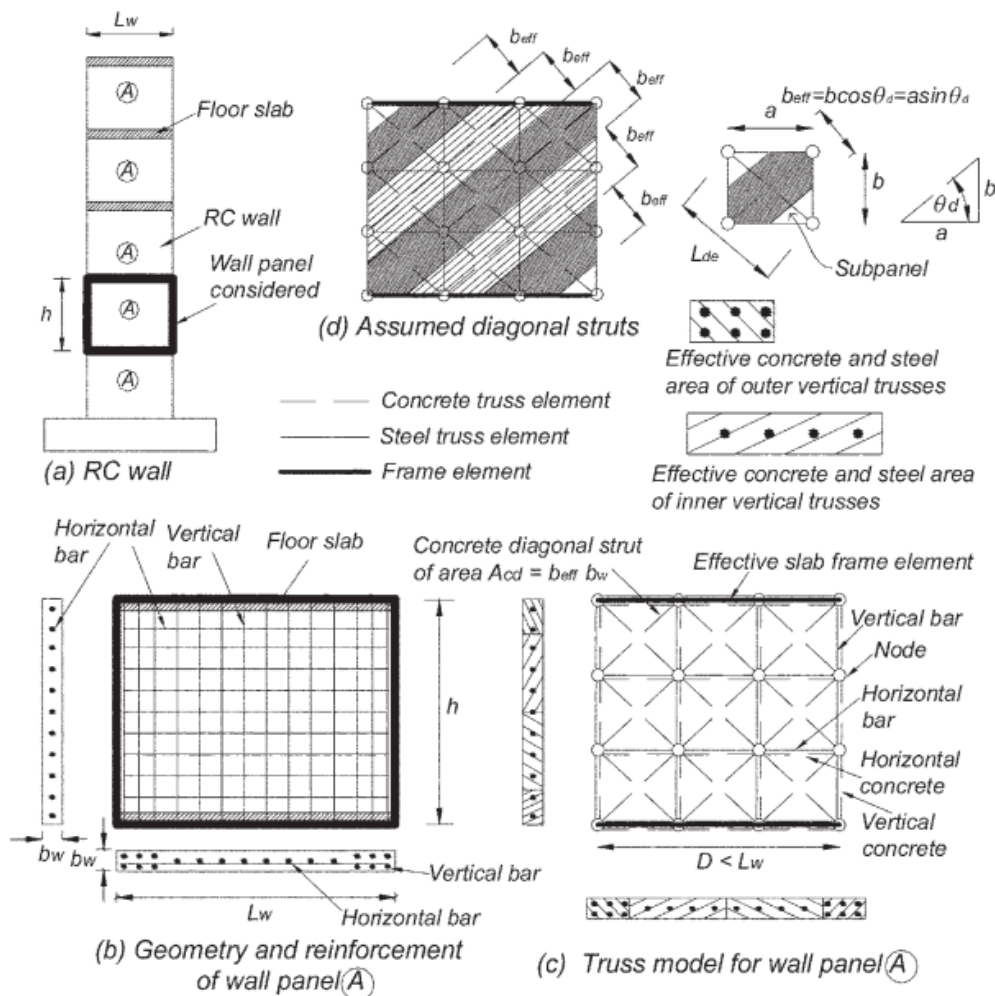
RC Wall and Wall Panel Truss Model (Panagiotou et al., 2012)
